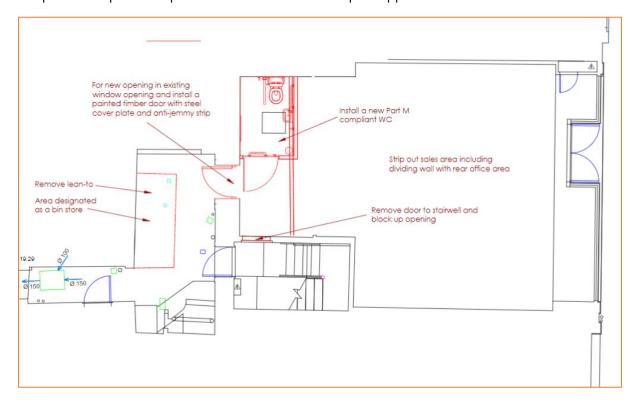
Proposed ground floor plans for the development (Source: hdp associates)
